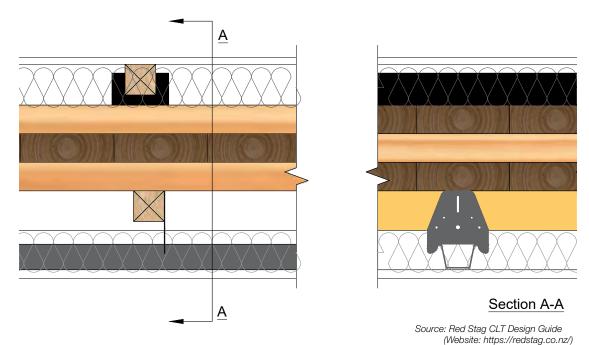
Mass timber floor with a generic lightweight floating floor system - Option 2
